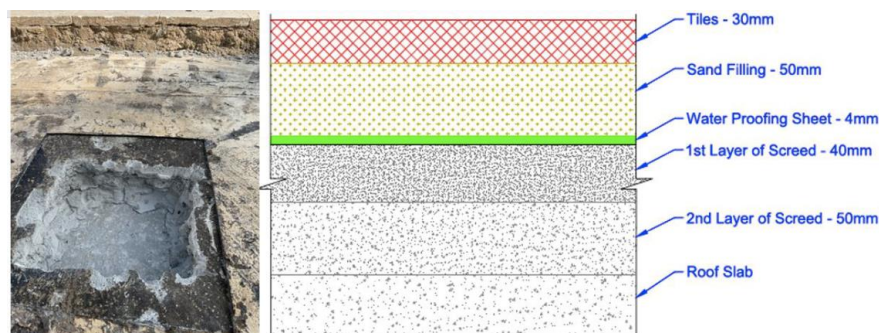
Roof protection system as found at the location with a section showing different layers of protection
